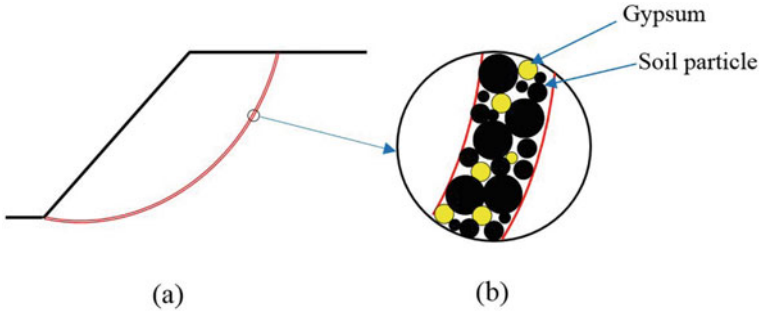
a Slope failure mechanism. b Imaginary enlargement of shear failure surface
